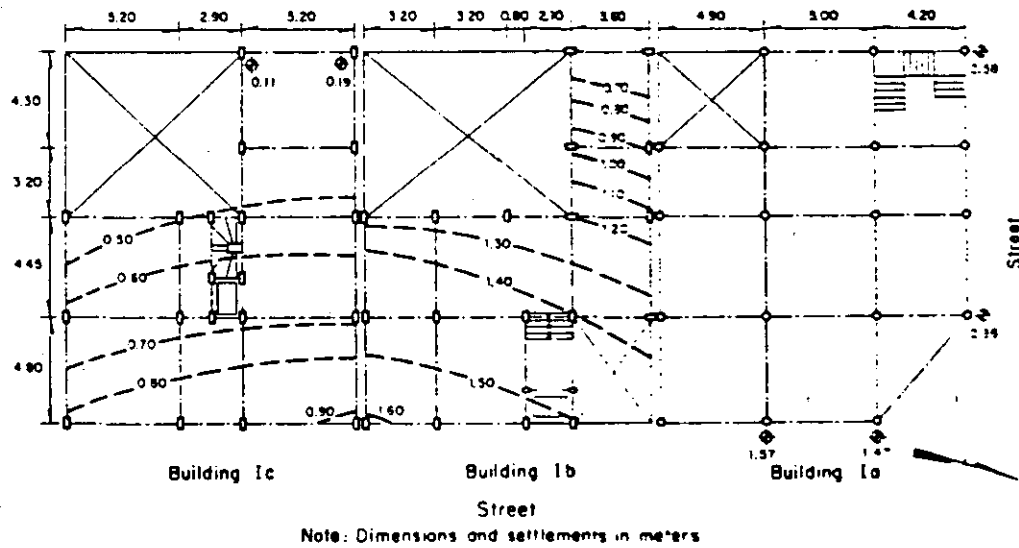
Plan and outline of settlements in three buildings on mat foundation.
